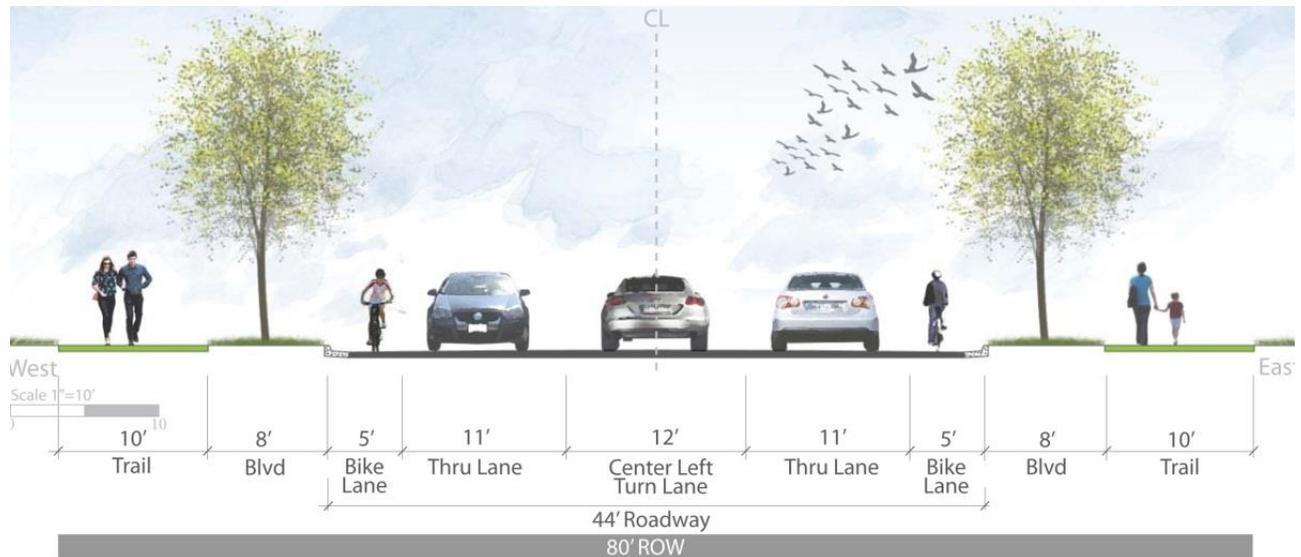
, 2nd Street Extension Concept – 80’ Right-of-Way
